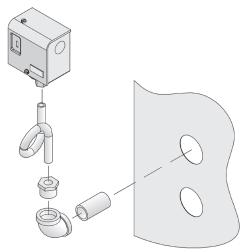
Pressure Limit Installation for Probe LWCO Equipped Boilers
